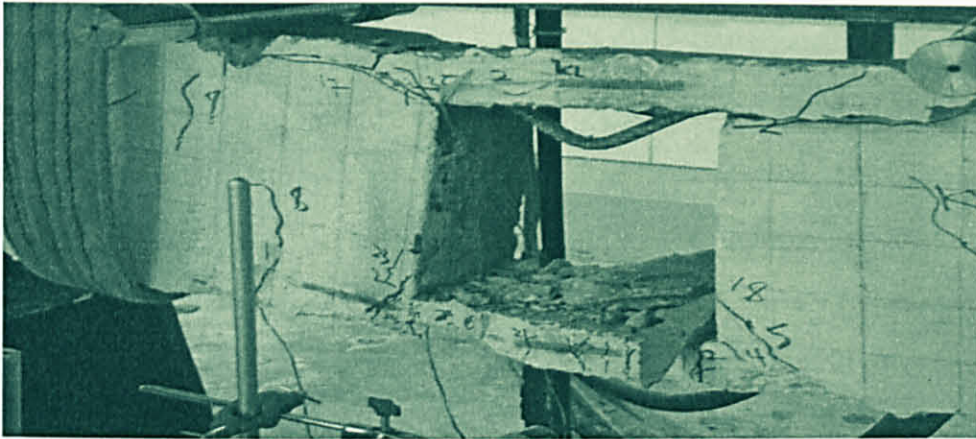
Failure of beam with large square opening at the center of the beam.
